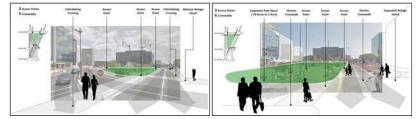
Pedestrian Access to Cobb Park Before & After Capitol Crossing Project (Street POV)
